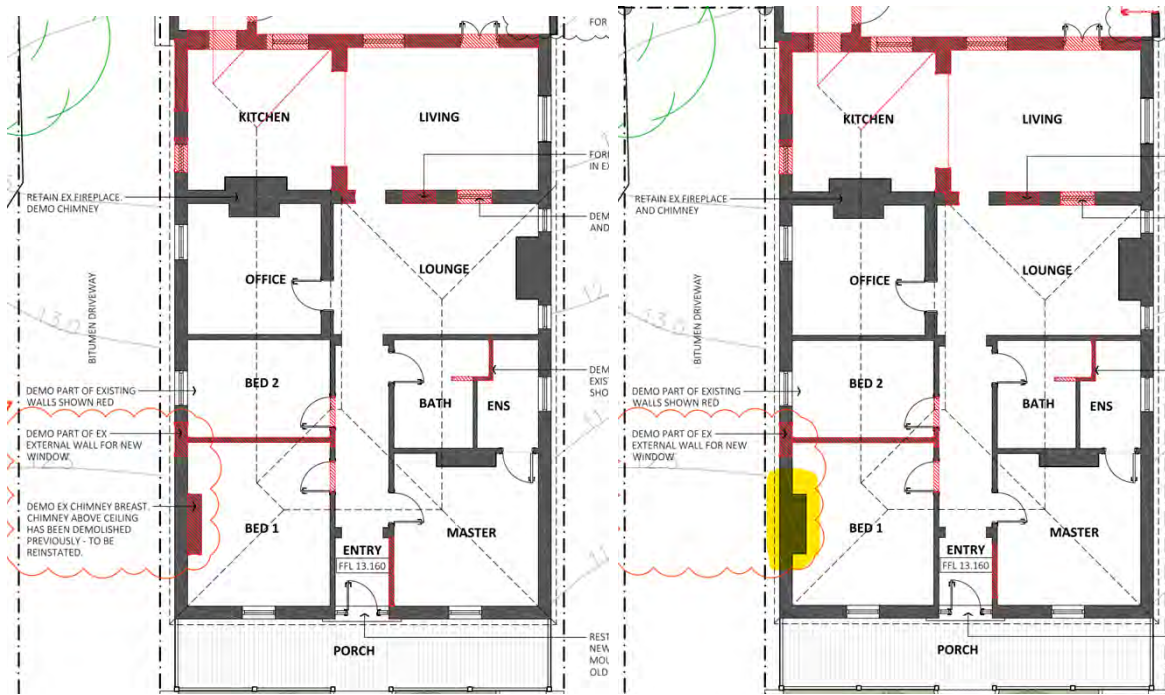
previous plans on left, amended plans on right that show retention of all fireplaces, including chimney fireplace in Bed 1 (highlighted)
